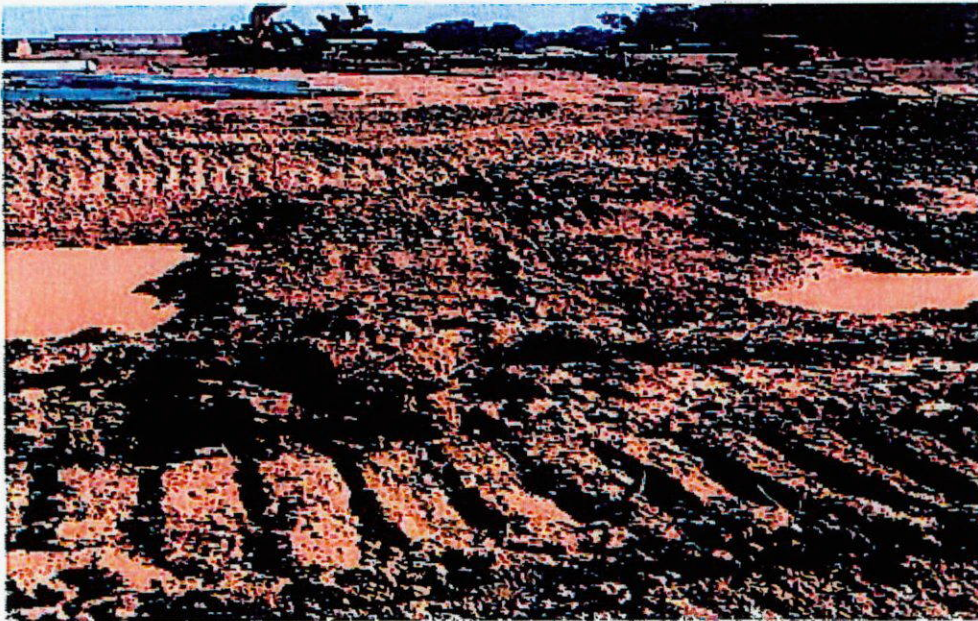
Facing southwest, west side of development without perimeter silt fencing.
